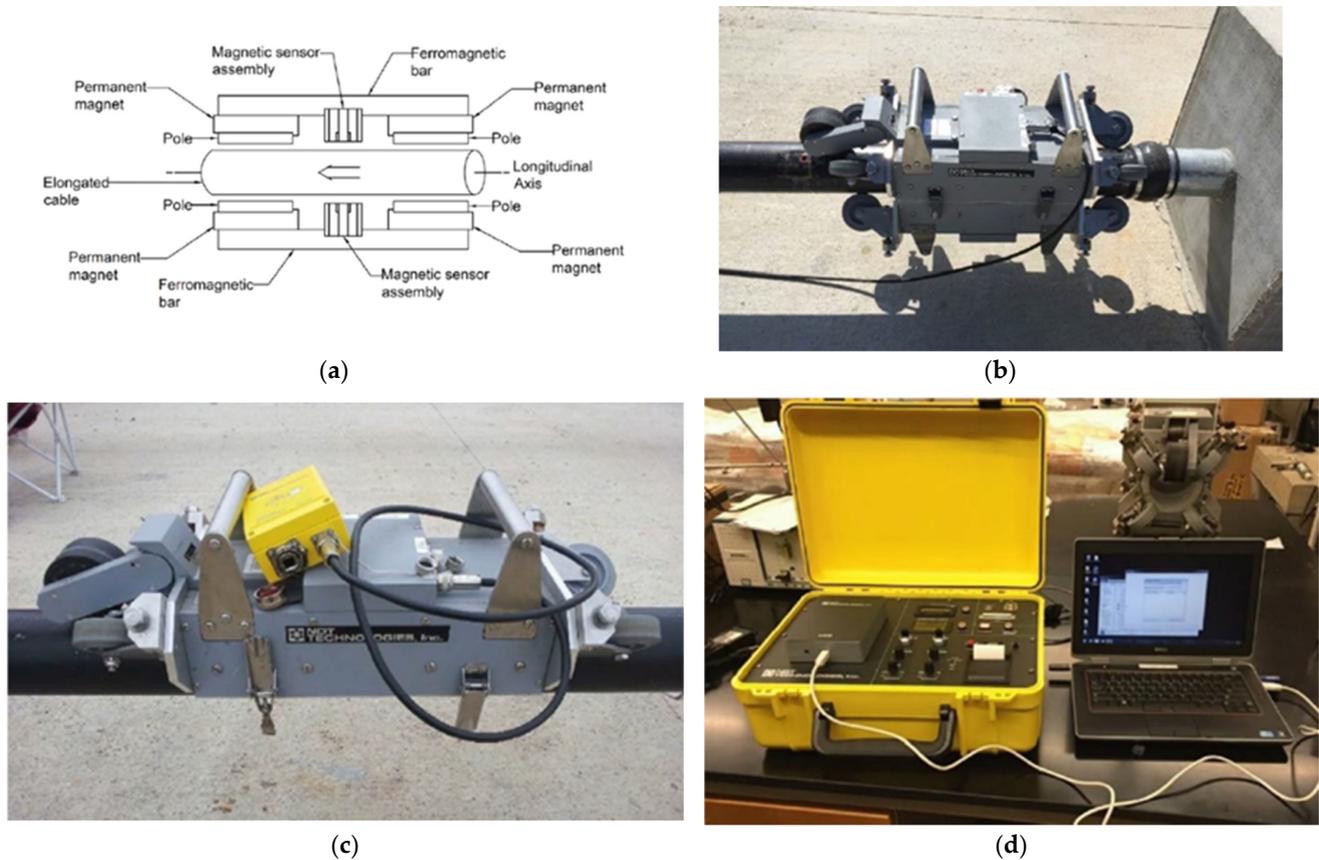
Magnetic flux leakage (a) sensor probe, (b) full head sensor, (c) half head sensor, (d) the connection of the NDE extension to the computer [9].
